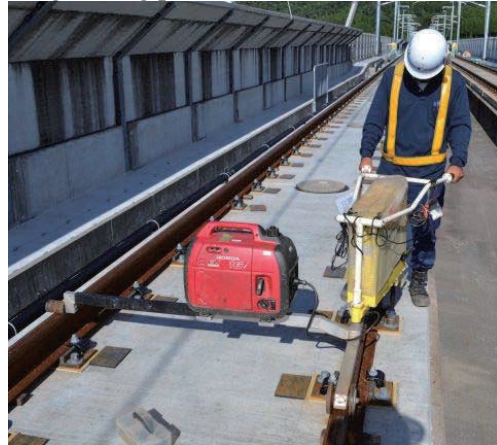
Measurement with a Track Master      Figure 9.7-74 Rail Fastening
